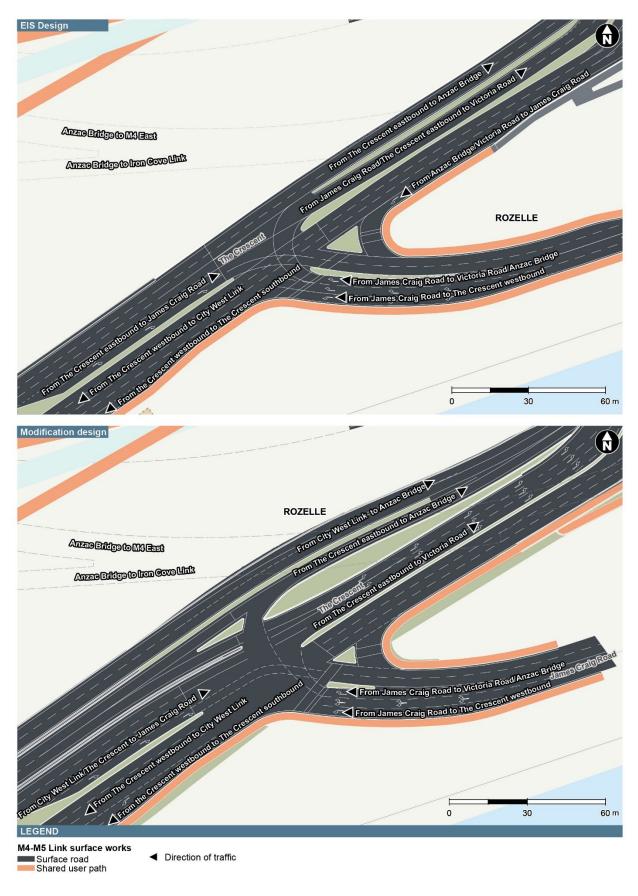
The Crescent/James Craig Road layout in EIS and proposed modification model
